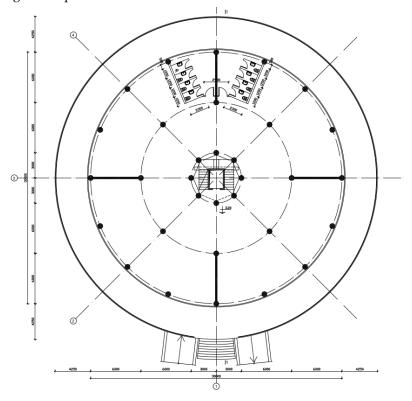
Plan of the second above ground floor of the World Museum of Seismic Isolation building where permanently acting exhibitions will be located
